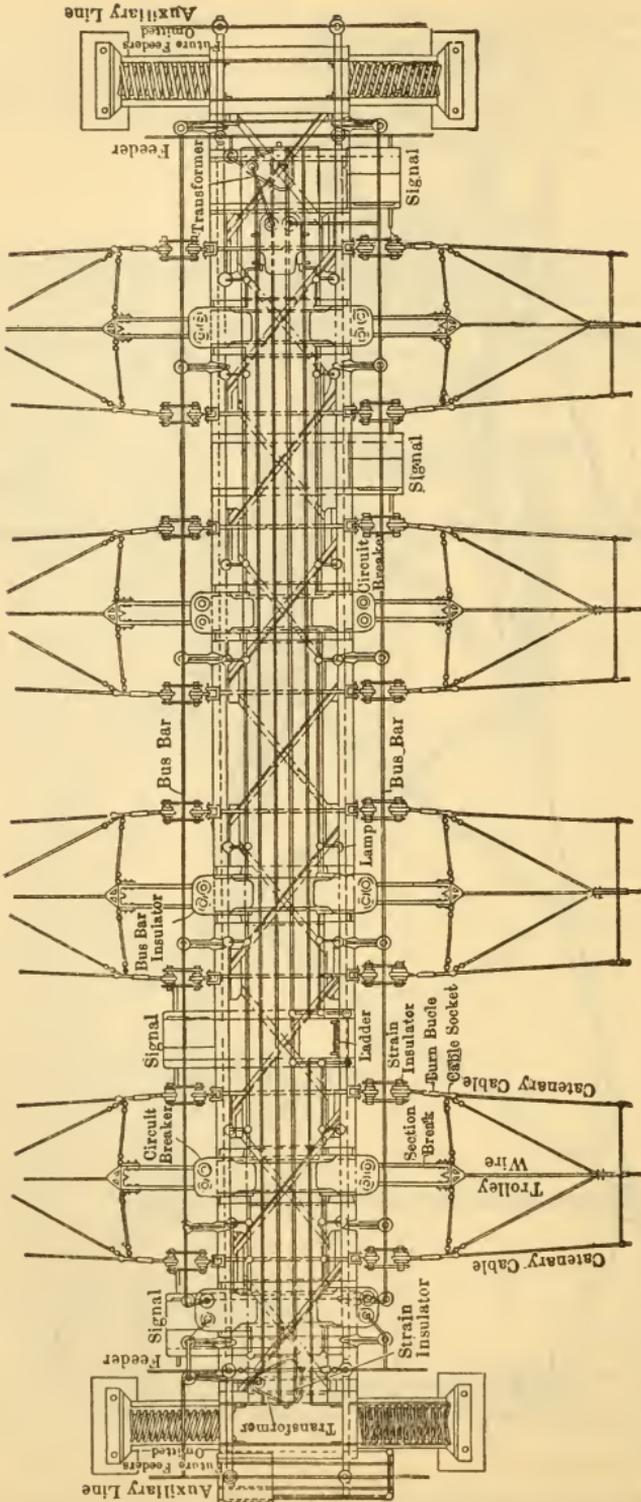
Plan View of Bridge for Supporting Catenary Hung Trolley, N.Y., N.H. & H. R.R.
